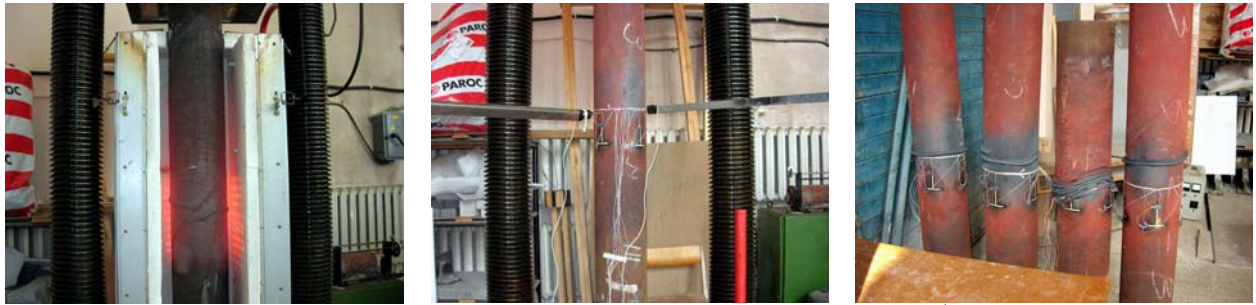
Views on the test specimens: a) HC-FST specimen after Type II 1st stage test; b) HC-FST specimen before Type II 2nd stage test; c) HC-FST specimens after Type II test.
